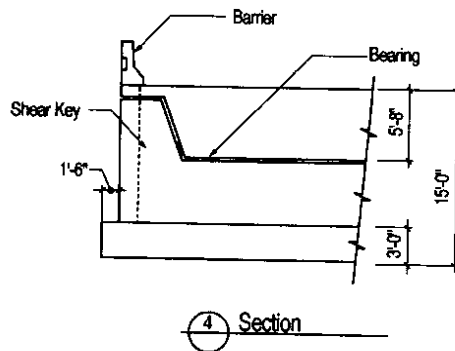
Cross-Section of Bridge (from Mast et al. 1996b).
